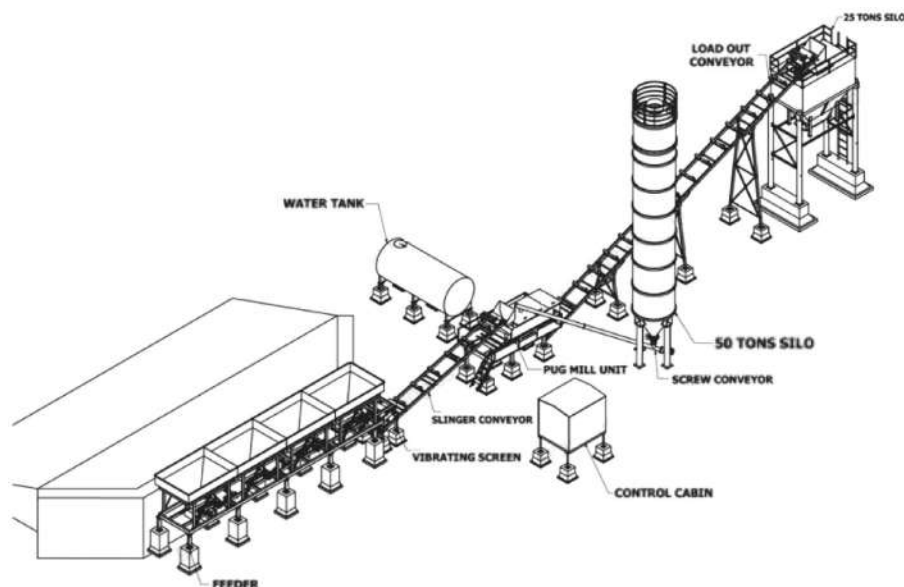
Typical Layout of a 200 TPH Wet Mix Plant with Filler Silo
